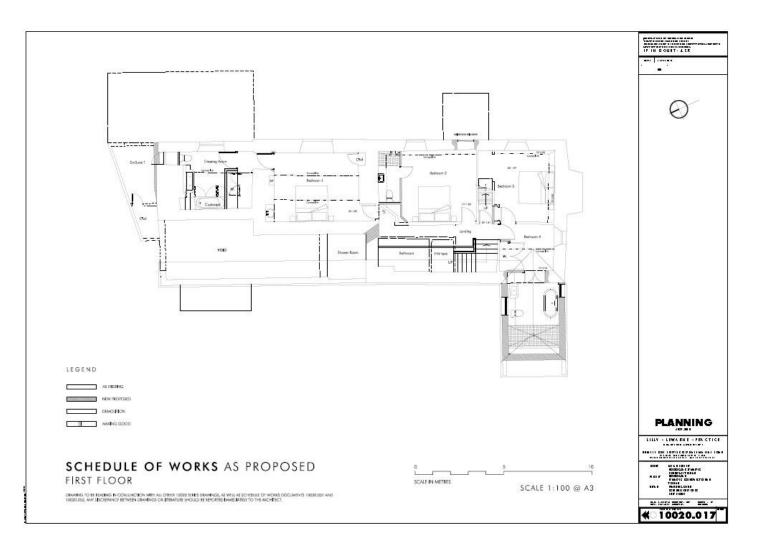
Bosloggas - First Floor Plan of Manor House (©Lilly.Lewarne Jan 2011).
